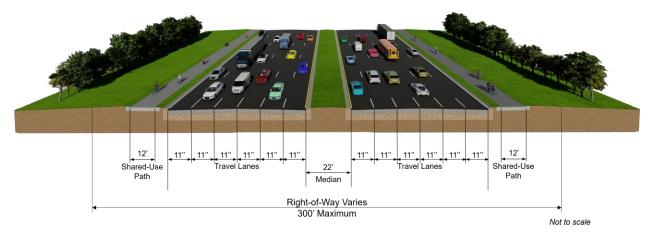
Preliminary Typical Section for Twelve-Lane Roadway
